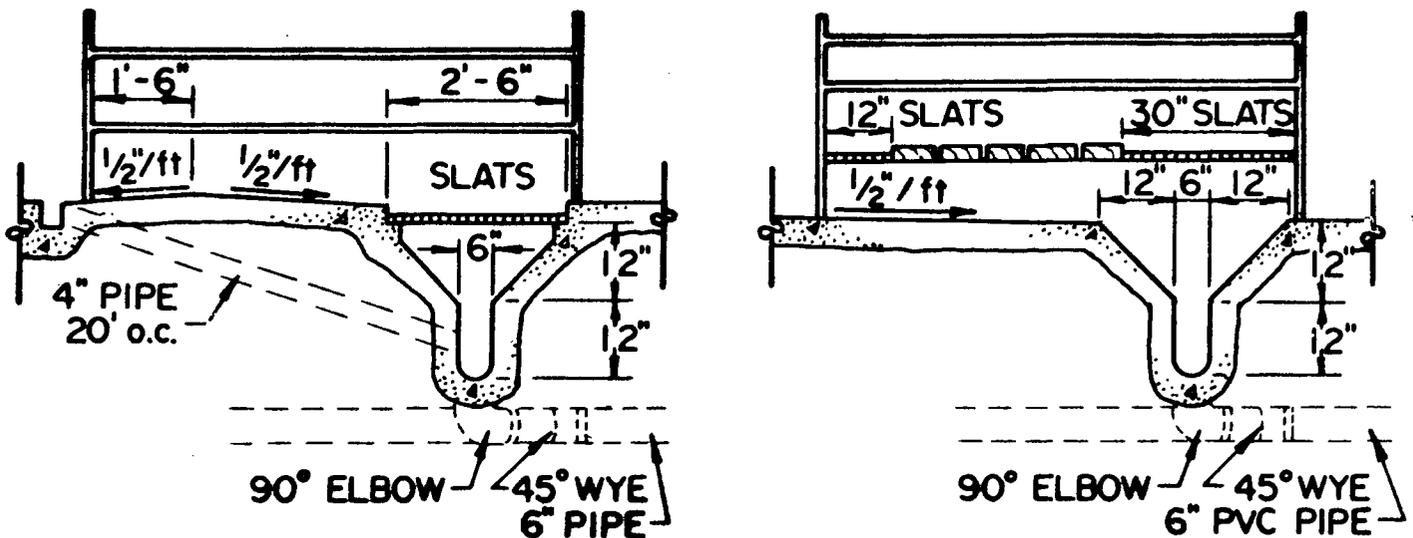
Y-shaped gutters used with floor-level (left) and raised (right) farrowing crates.
